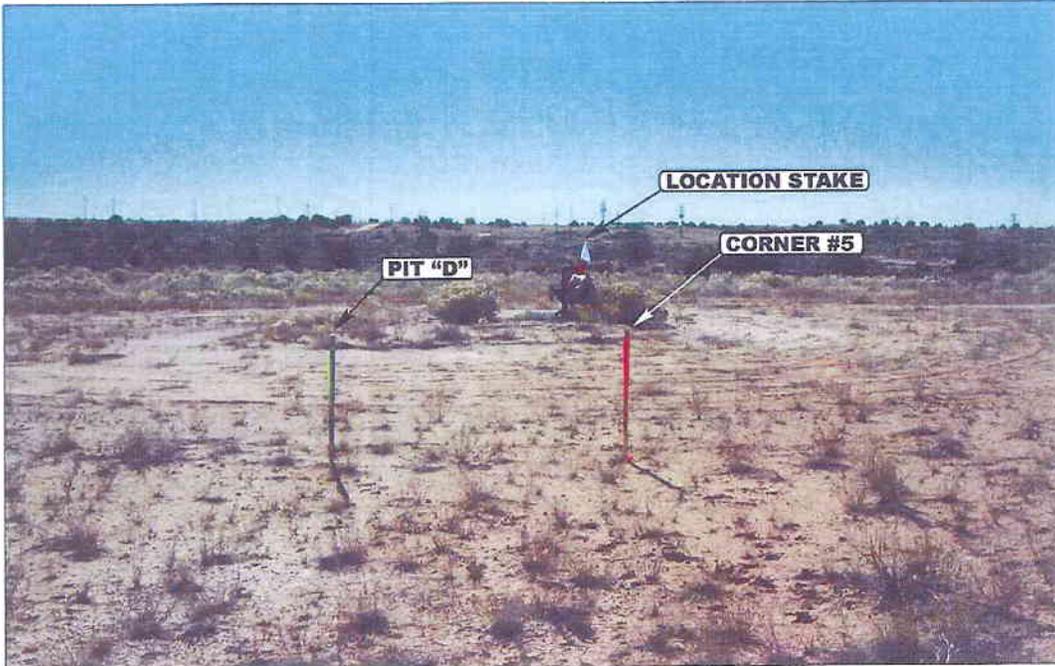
PHOTO: VIEW FROM CORNER #5 TO LOCATION STAKE
